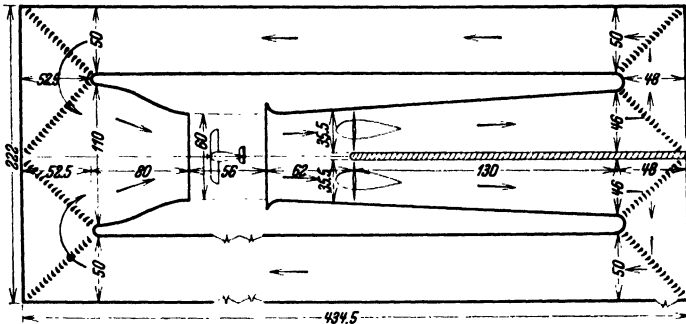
Full Scale Tunnel, U.S. N.A.C.A. Plan View, Dimensions in feet.
